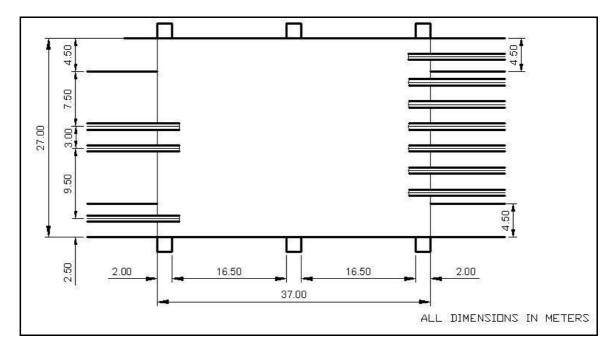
Top View Crossing Junction Switch Platform Dimensions
